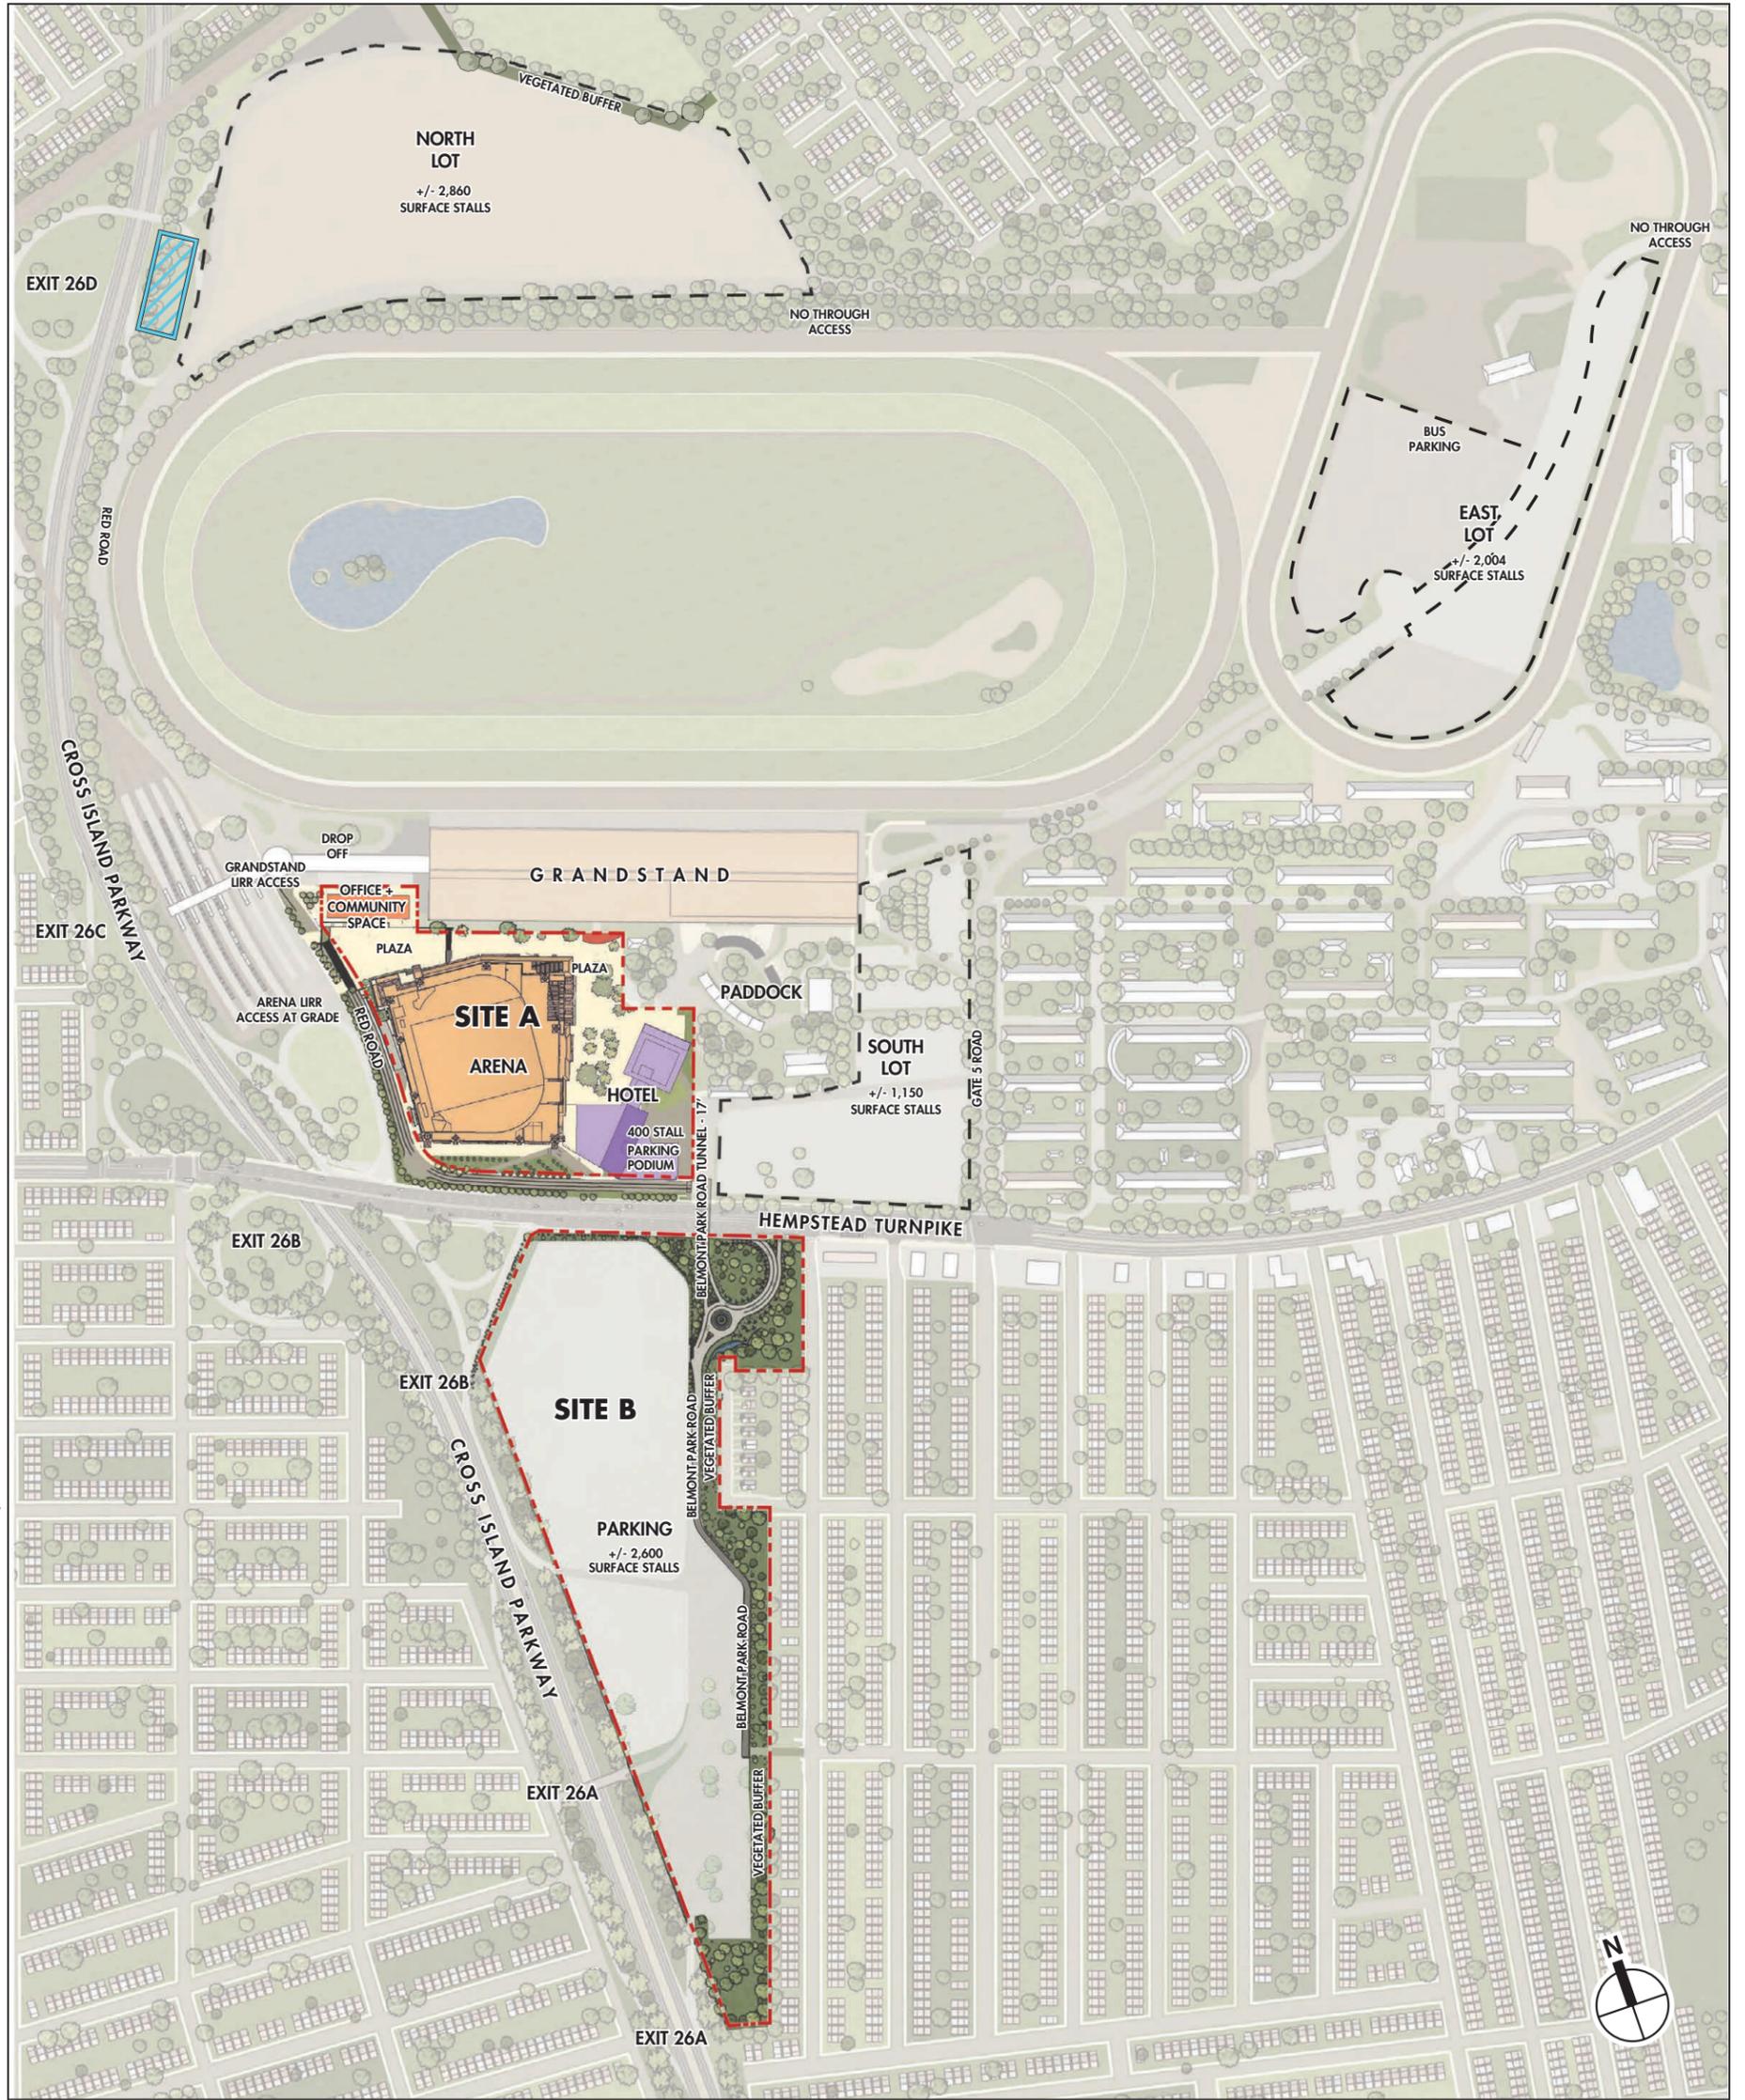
provides an illustrative site plan of the No Retail Village Alternative.
